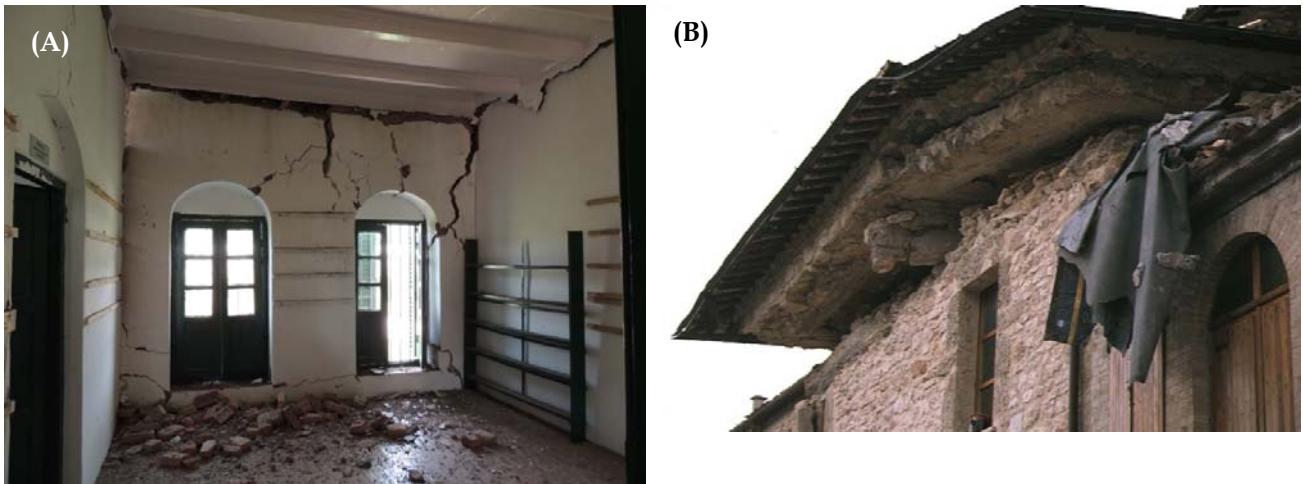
(A) Separation of roof slab and joists from supporting walls with out-of-plumb walls; (B) Separation and sliding of roof system from the supported façade wall, which is also out-of-plumb
